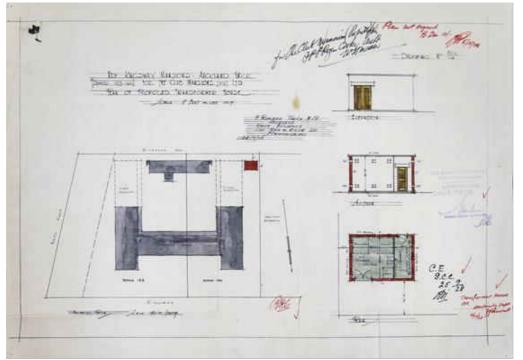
Site of the proposed residential flats along Kingsway Avenue, plan shows location of proposed transformer house on Stand 160 and proposed extensions of both wings in southern direction
